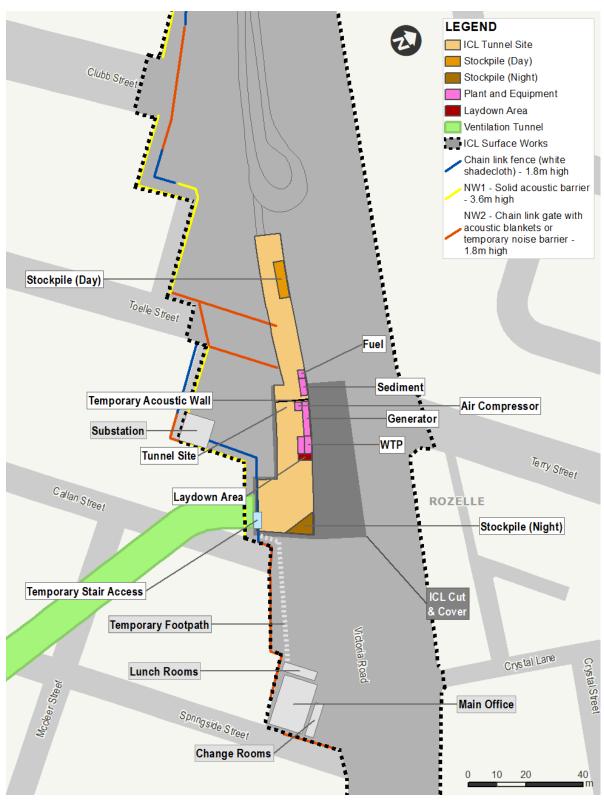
Indicative Layout of tunnel support site within the Iron Cove cut and cover
